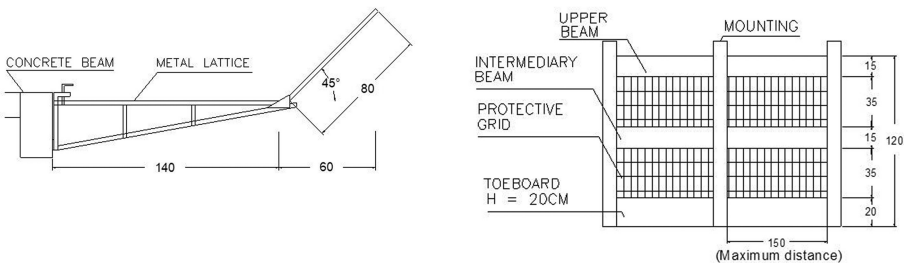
Protection systems for falls from heights: Platform and Guardrail and Toeboard.
